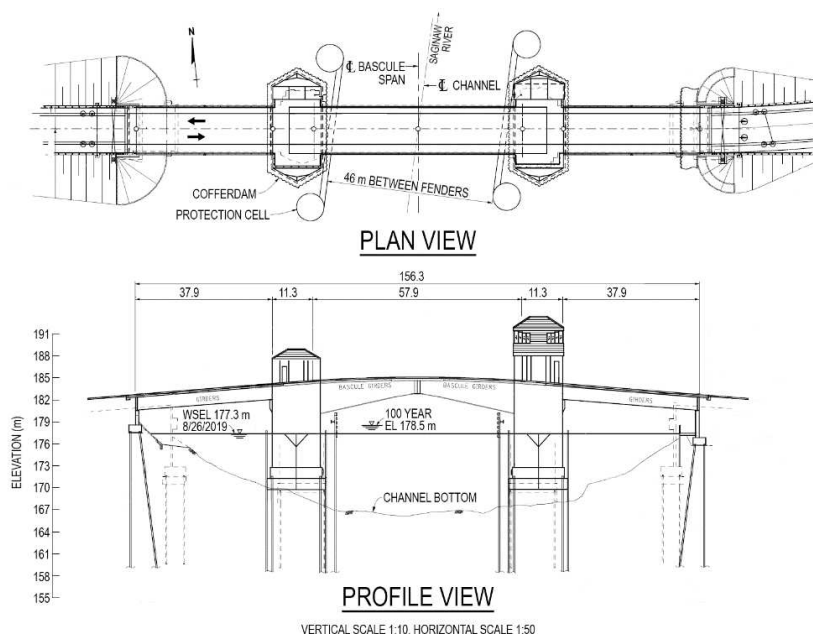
Plan and profile views of the proposed Lafayette Avenue Bridge, © 2020 MDOT. Modifications by FHWA.
